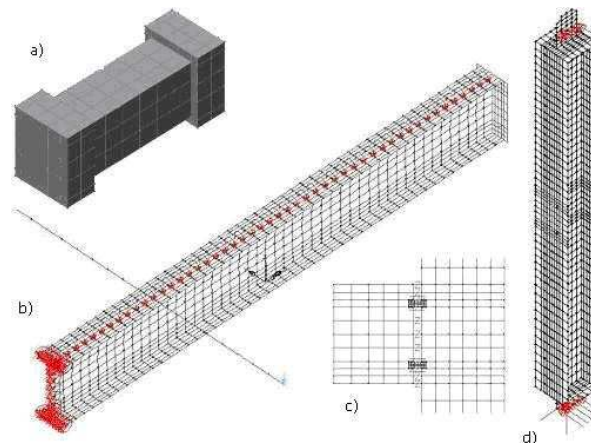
Finite element model of a flush end-plate bolted beam-to-column sub-structure: a) bolt; b) beam and end-plate; c) detail of joint; d) column and plates at the columns ends.
